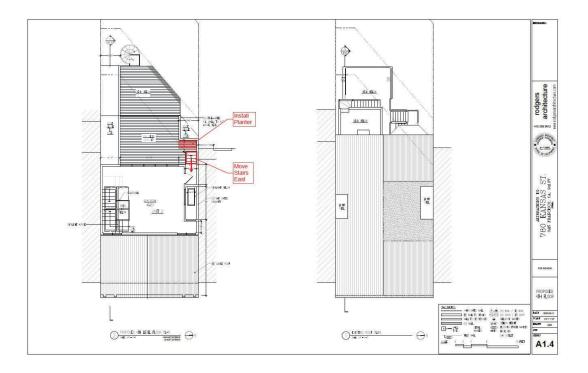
Fourth Set of Proposed Settlement Offer Revisions February 18, 2020 --Revised 4th Floor Plan -- Planter installed & stairs to roof deck moved to the east for privacy
